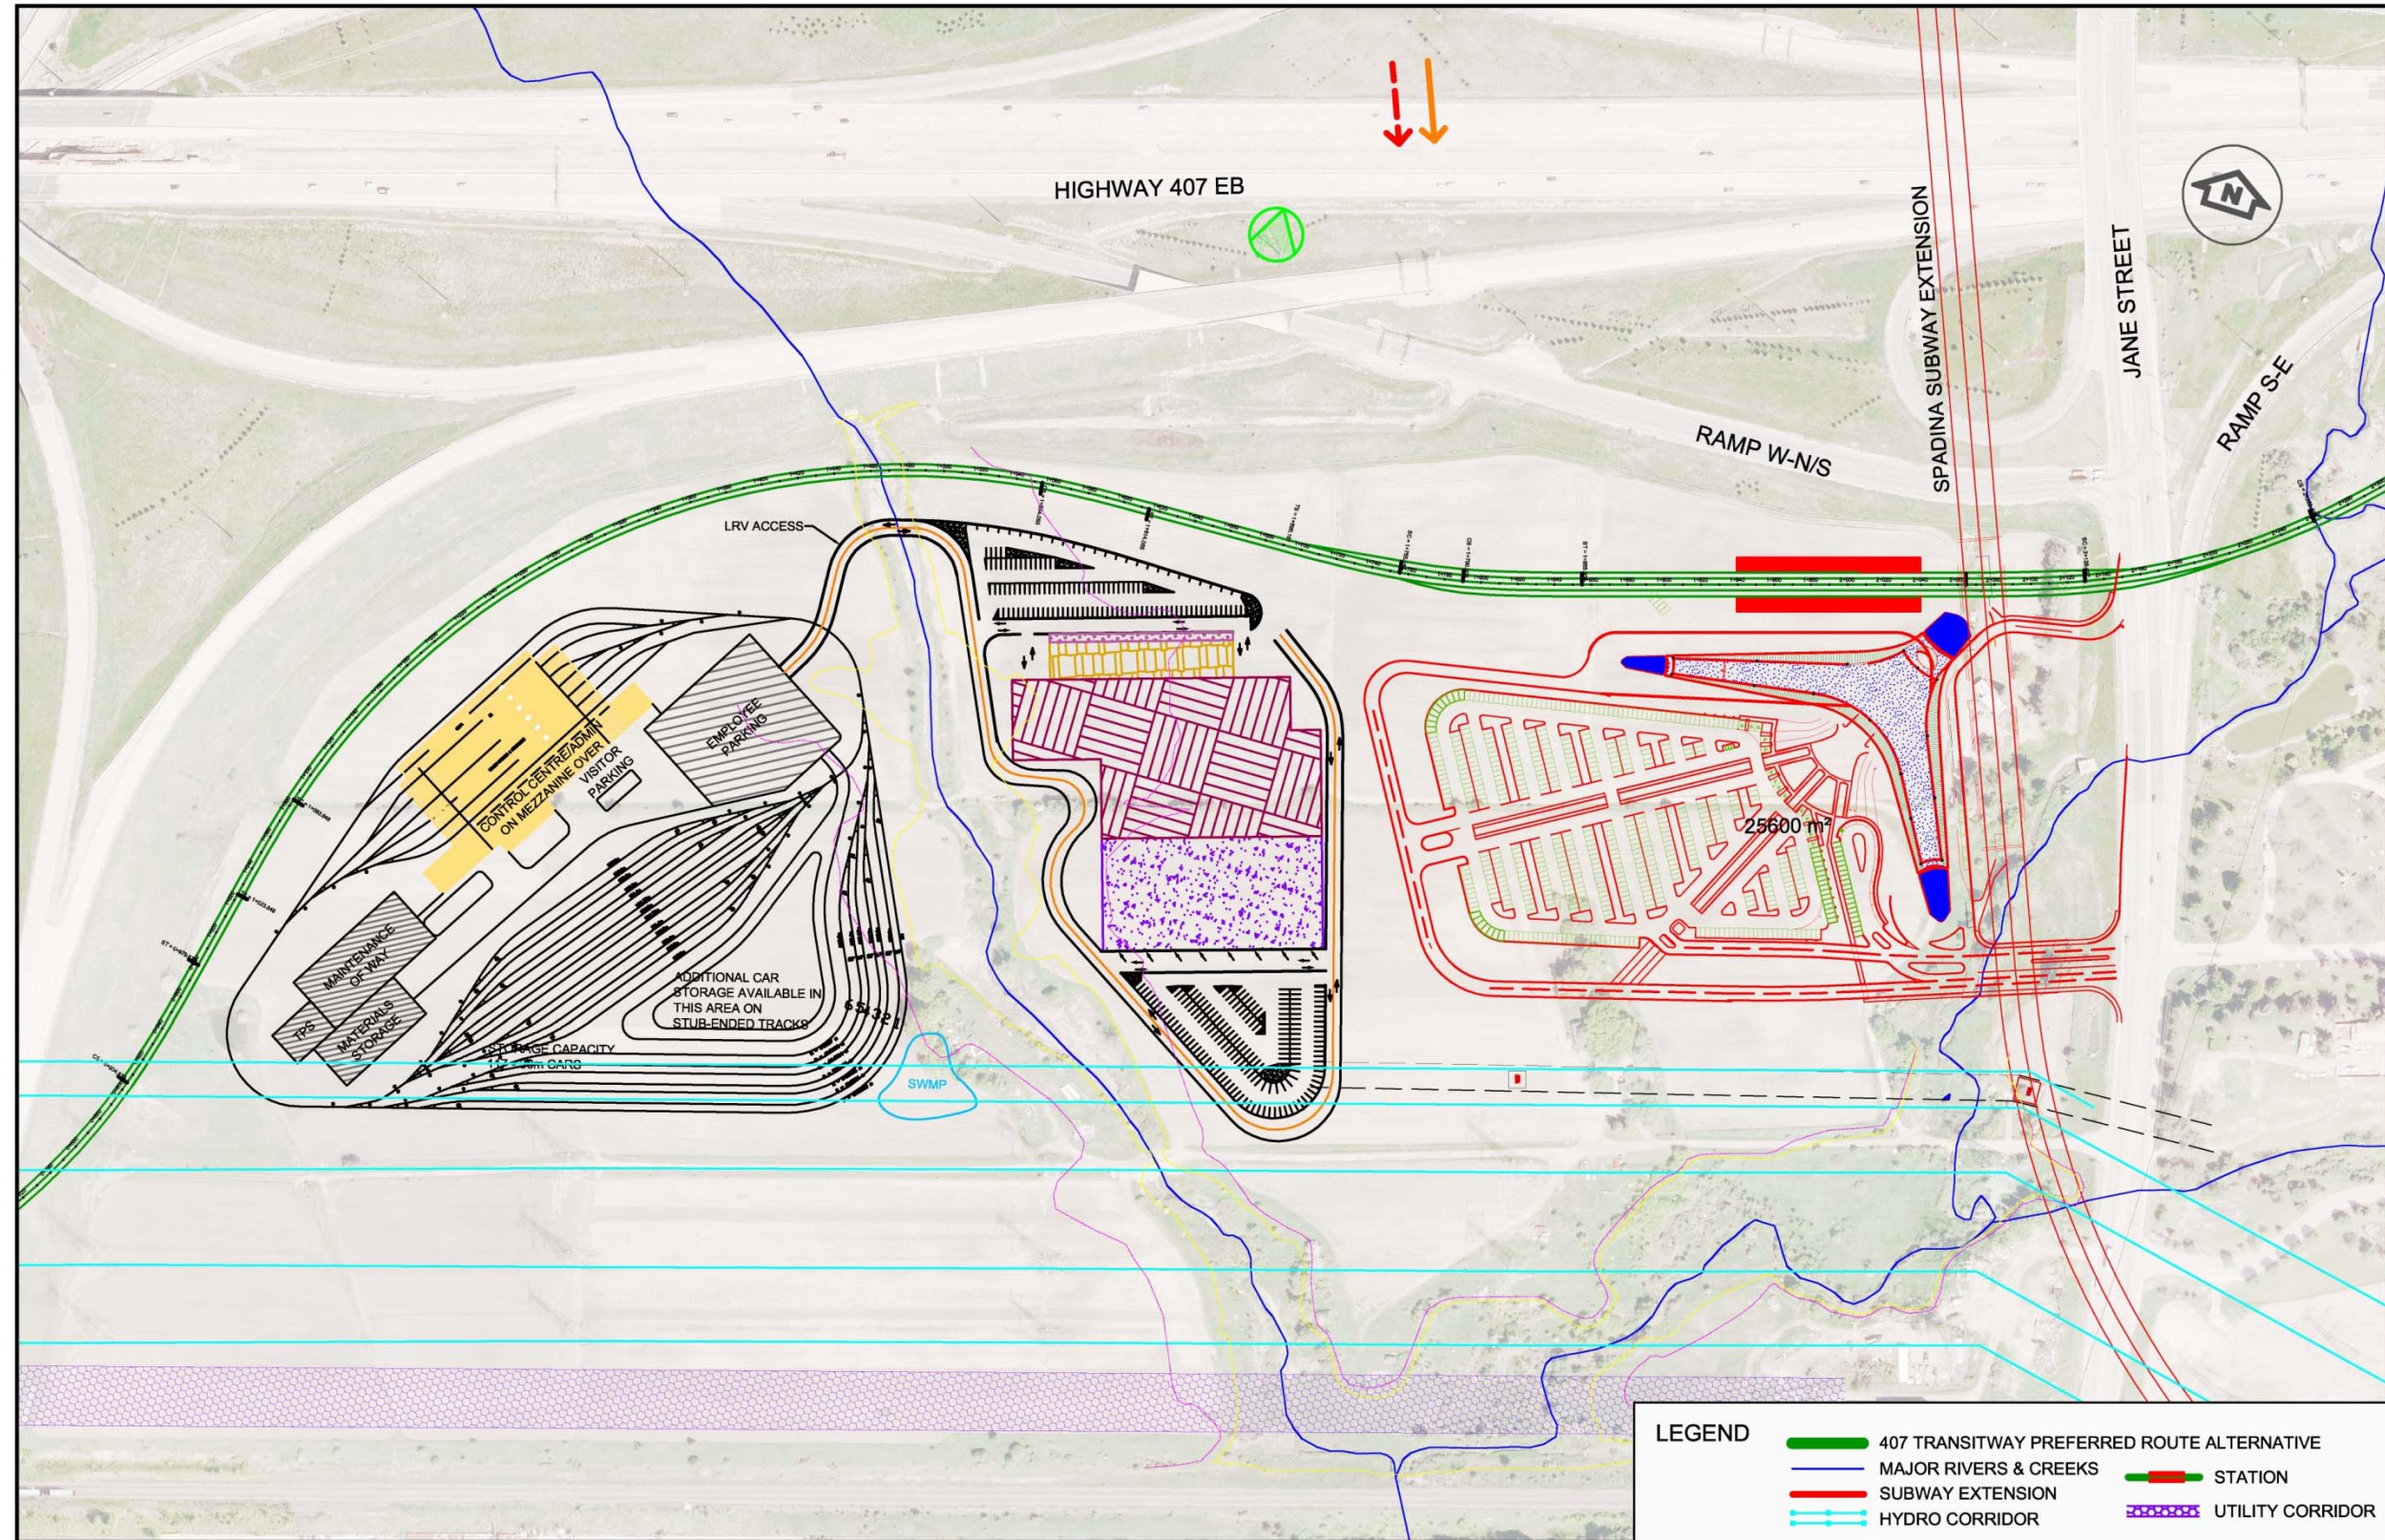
(b): Conceptual Layout of Typical Maintenance and Storage Complex Alternative B
